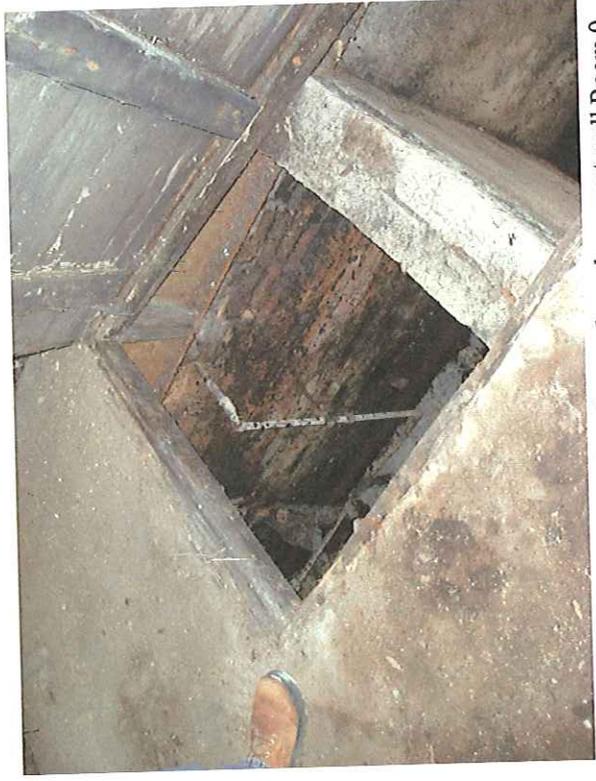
Second flooded pit under trapdoor along west wall Room 9.
